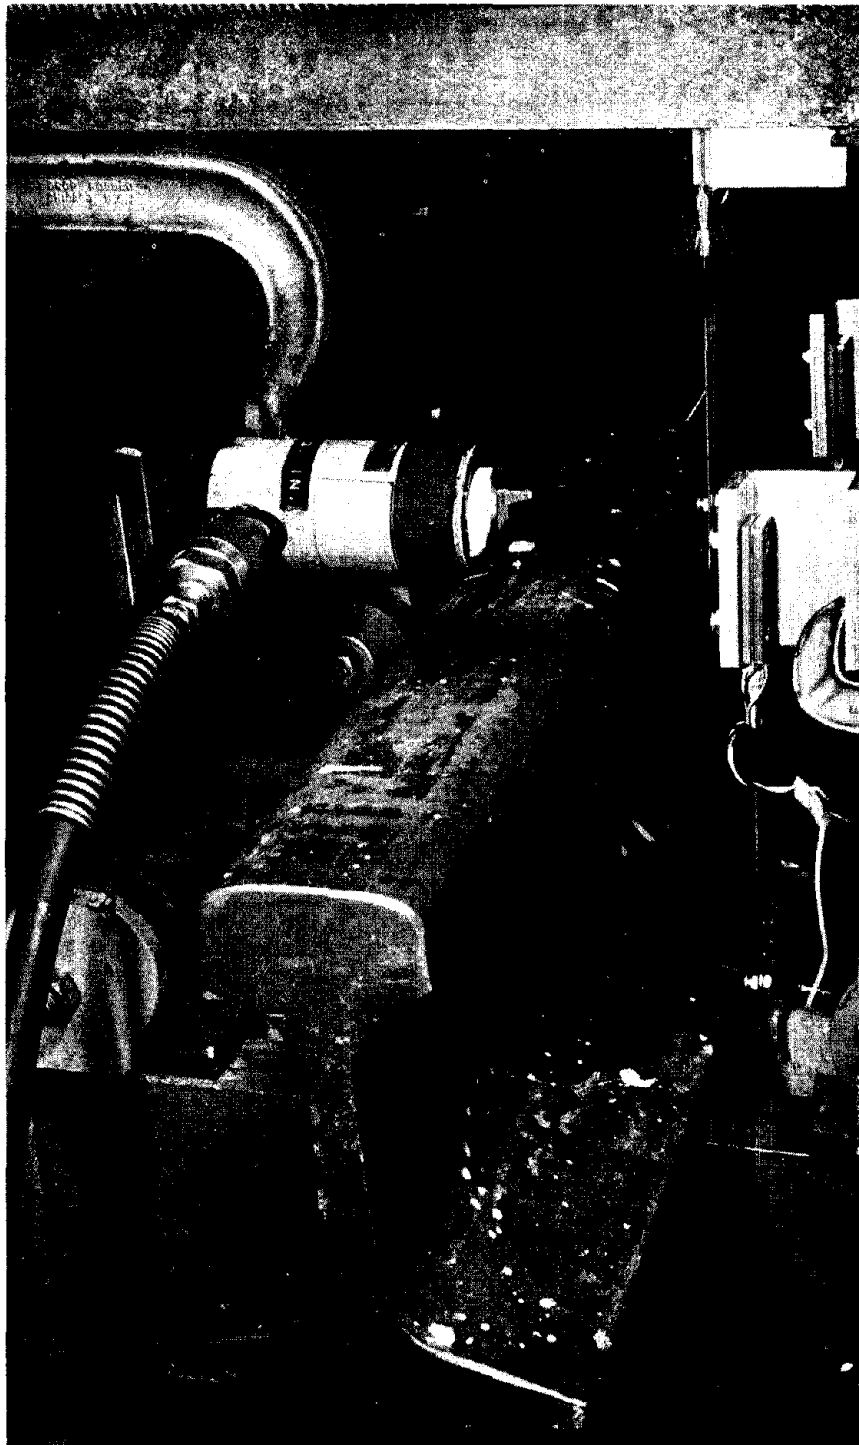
, Test Set-Up for Fastener Resistance Test on Wood Ties About the Longitudinal Axis, Showing Load Application Arrangement and Instrumentation.
